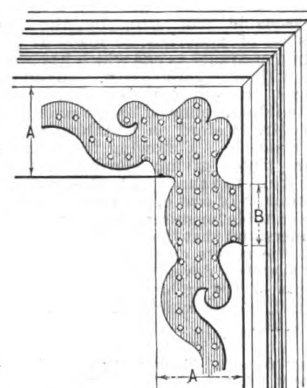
Application of a Hinge Strap to Rail and Stile.
